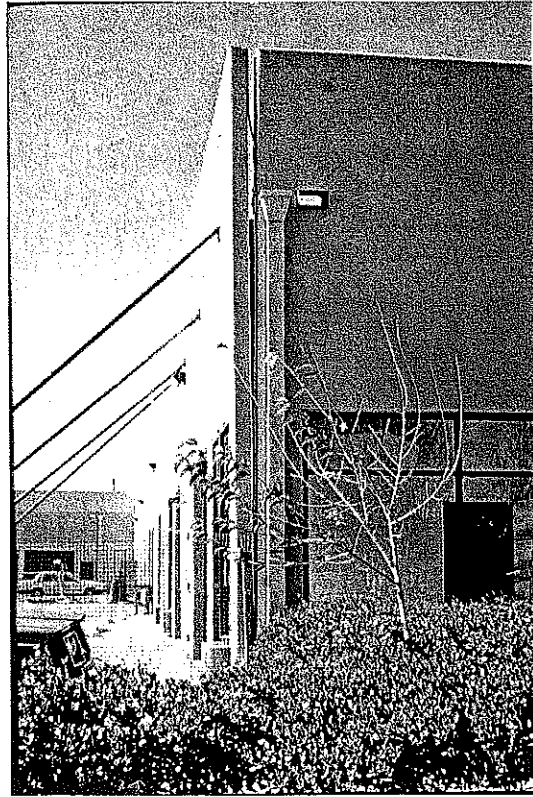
An example of wall separation from the roof of a building. When this happens, the walls can fall over, the roof can collapse locally, or both can happen.
